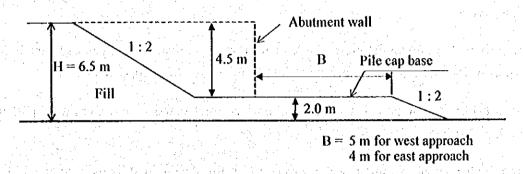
Fill in Longitudinal Direction after Commencing Construction of Abutment
